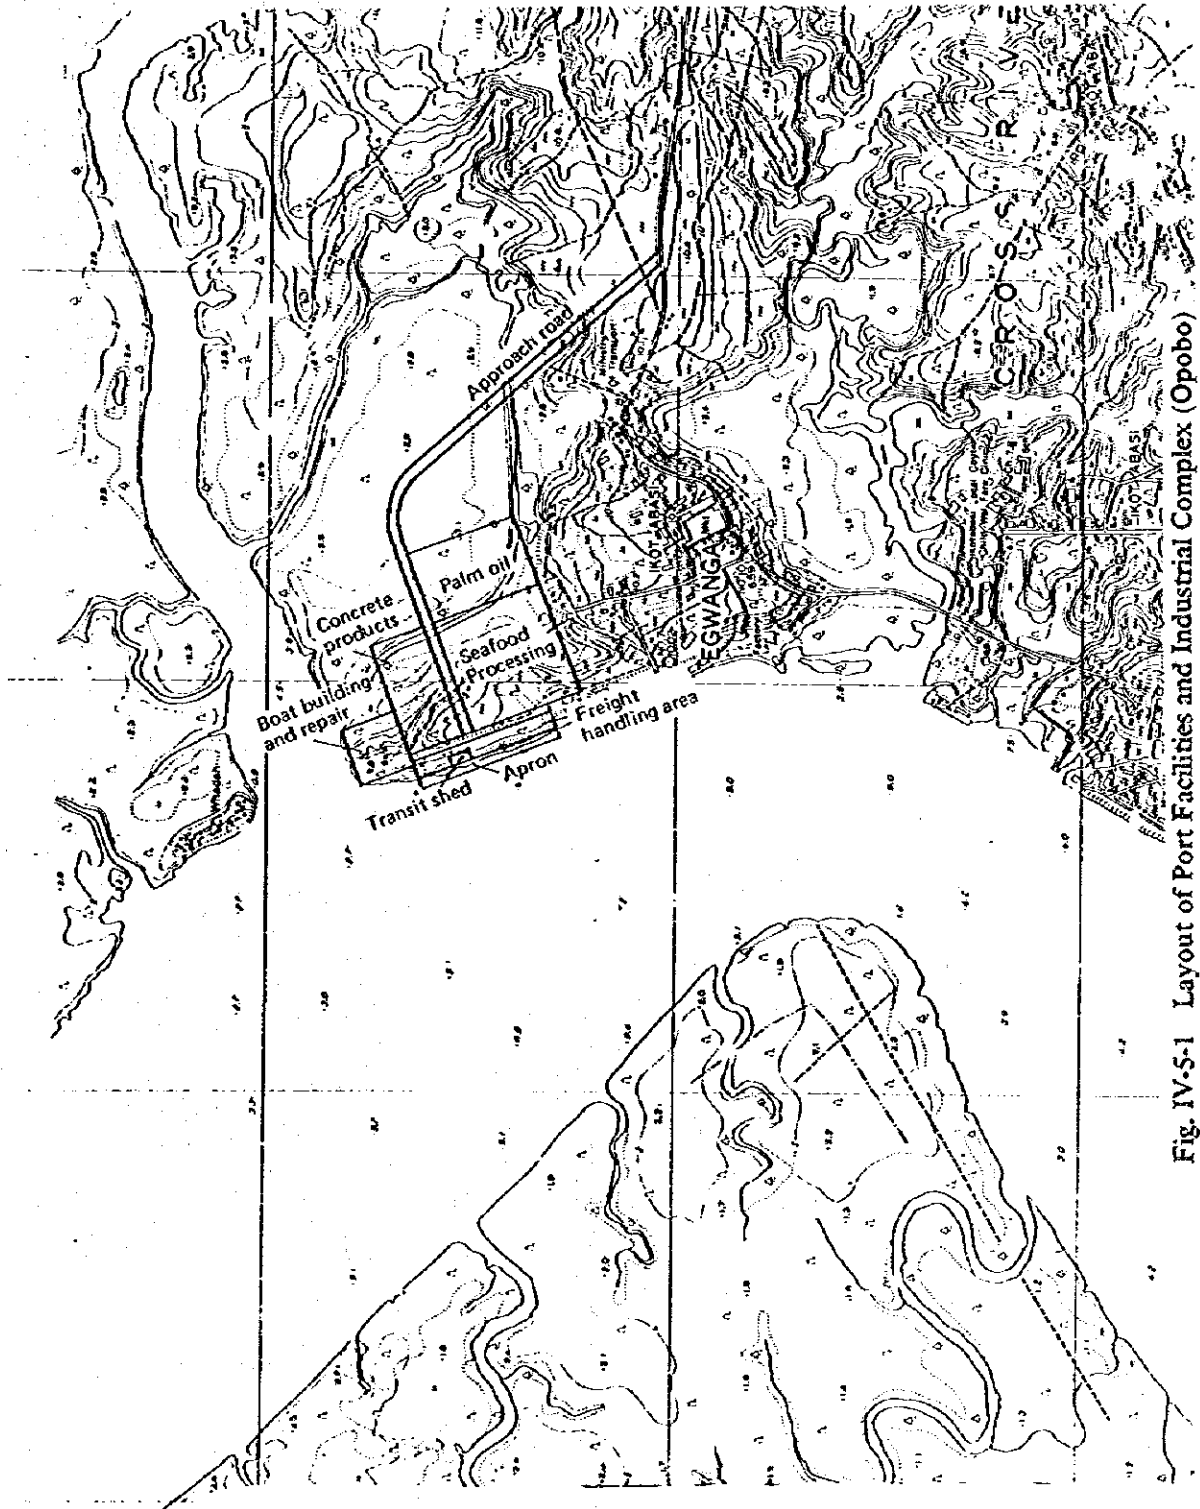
Layout of Port Facilities and Industrial Complex (Opobo)
